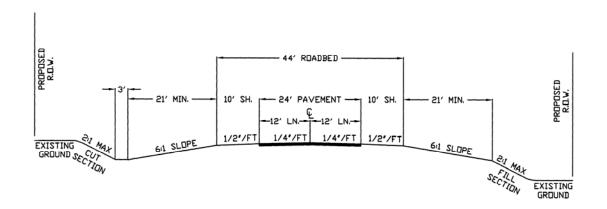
ALDOT: Rural, Two-Lane, Typical Cross Section.
